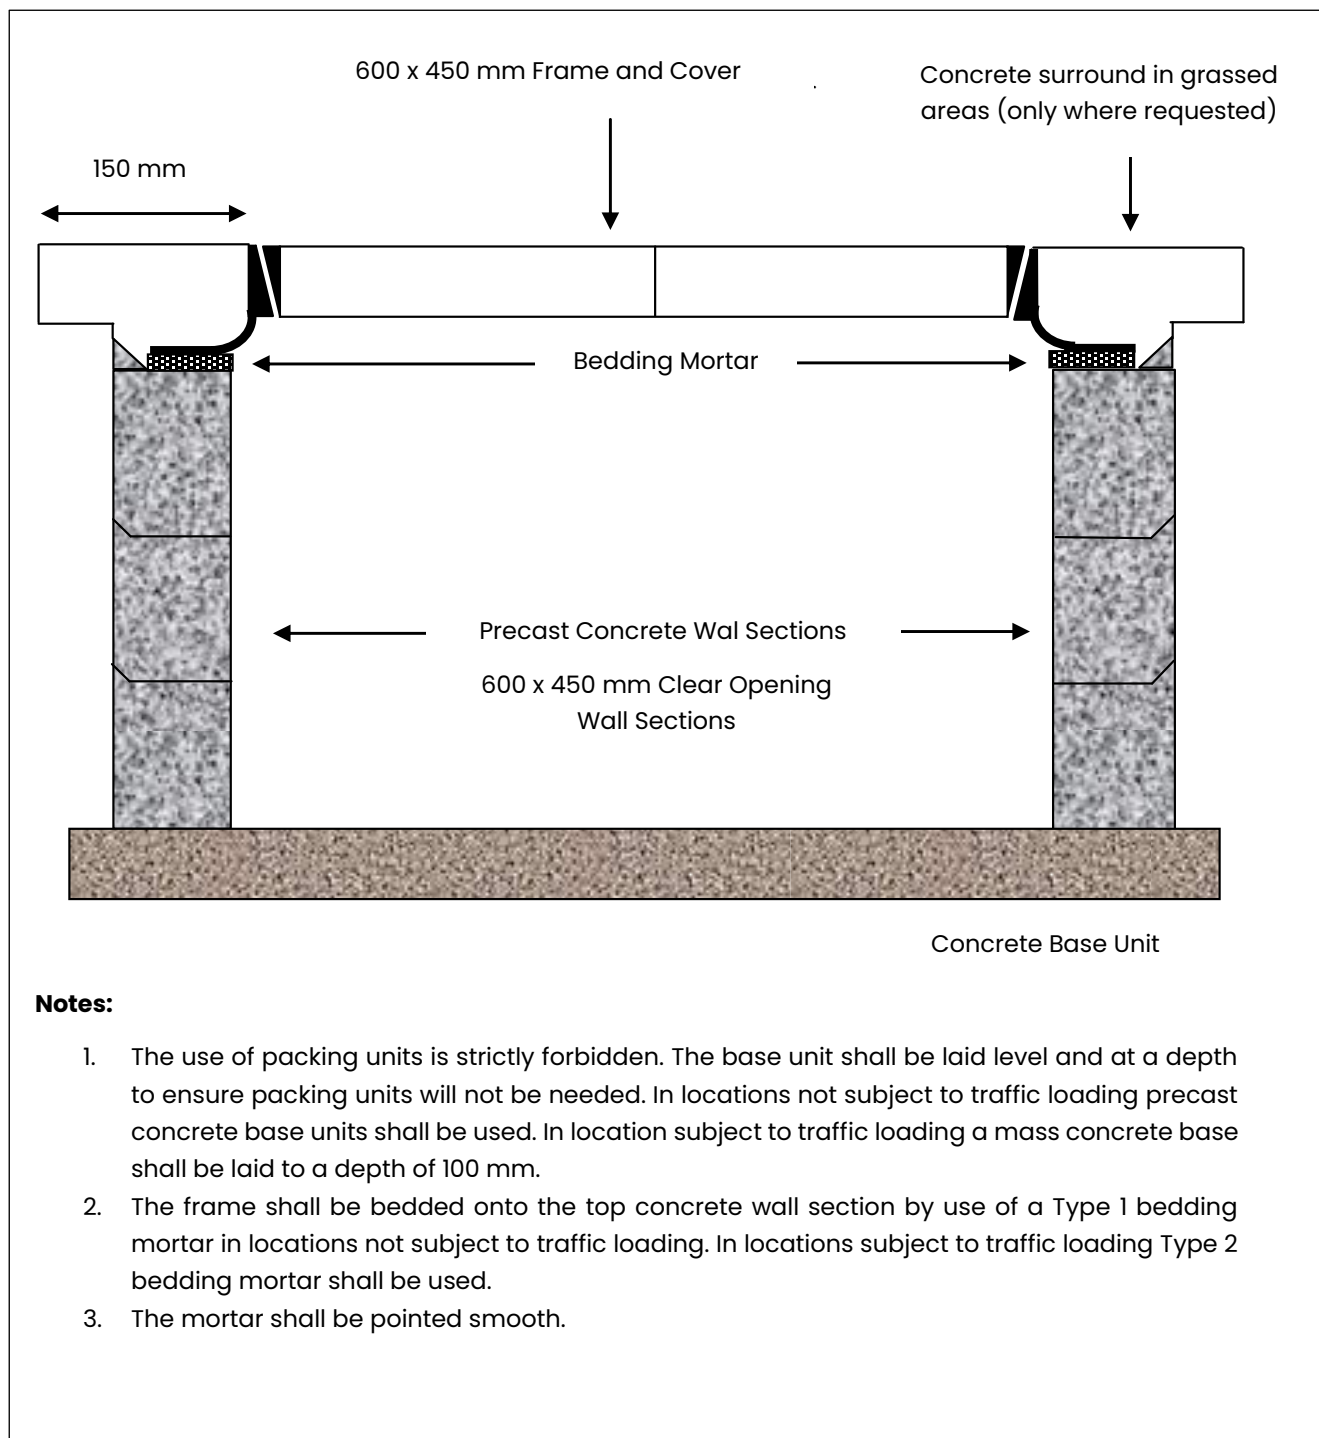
Precast Concrete Chamber with a 600 x 450 mm Frame and Cover
